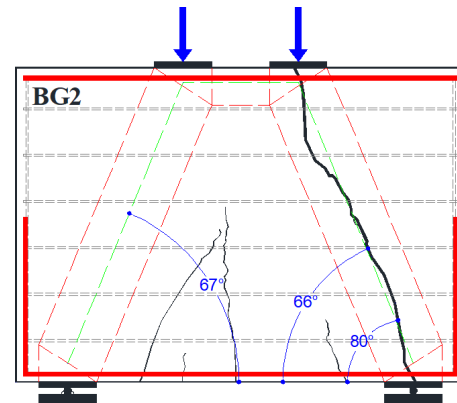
Crack pattern and mode of failure for vertical web reinforcement only with ratio 0.40%
